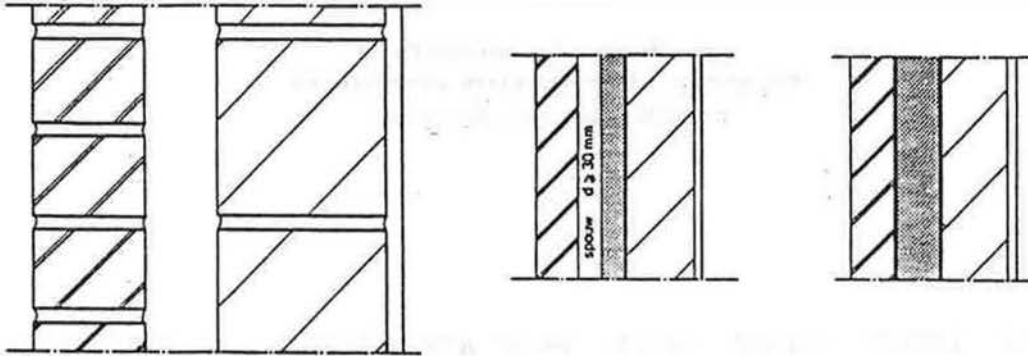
Traditional cavity wall FIGURE 2. Insulated cavity wall
